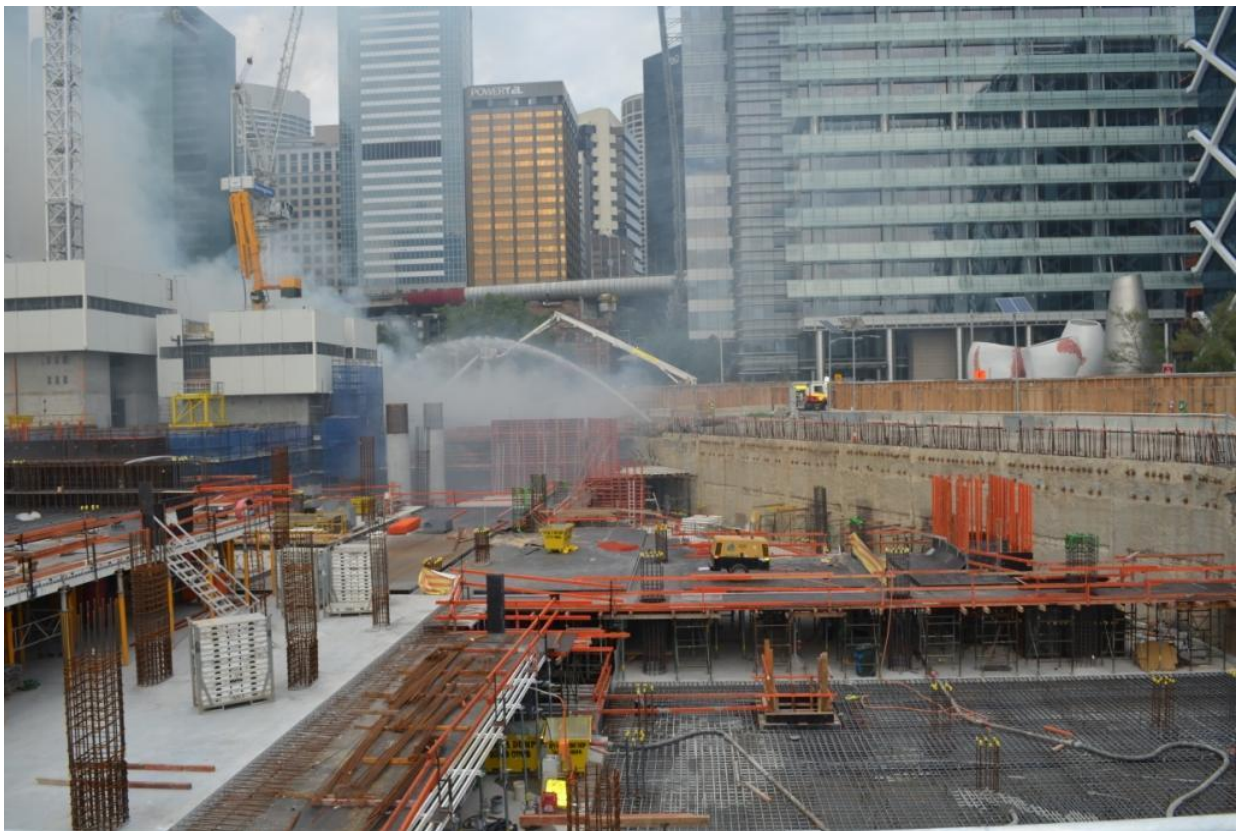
showing the placement and layout of formwork at a separate area of the Barangaroo site. Firefighting operations visible in background.
